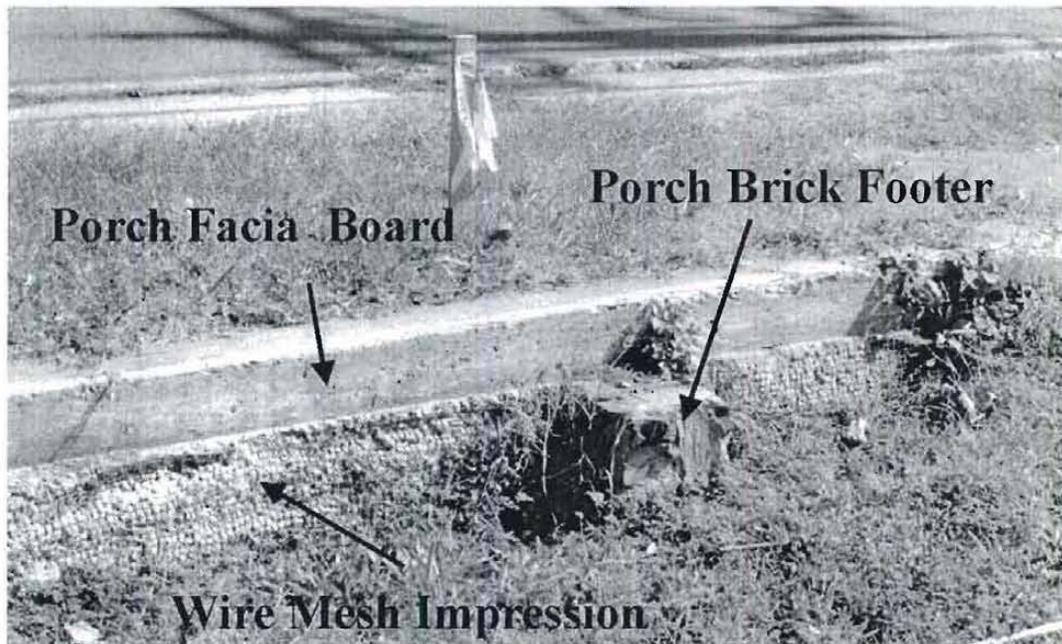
Curb Along SR 13 Showing Porch Brick Footers and Wire Mesh Imprint on Concrete
